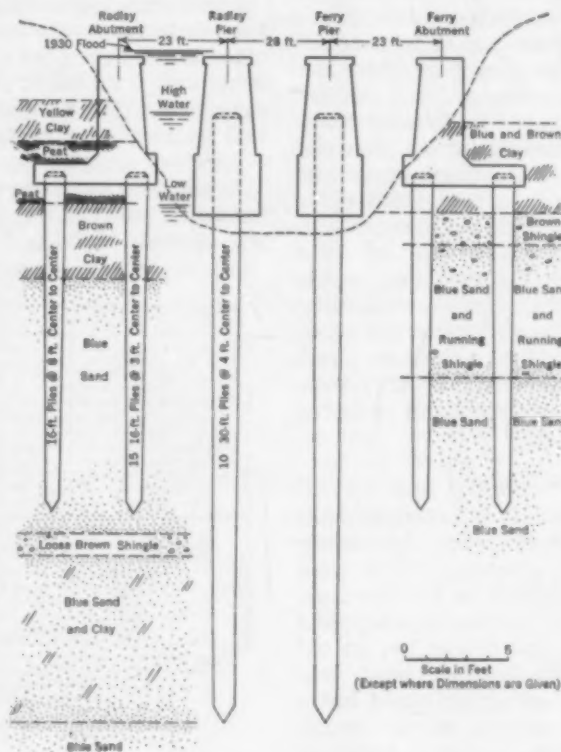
RADLEY BRIDGE, ABUTMENTS AND PIERS
